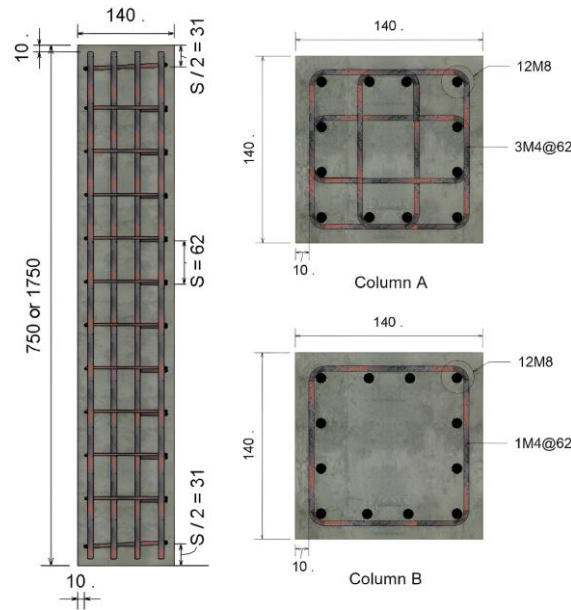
Geometric details of the 1/4-scale square RC column specimens (all dimensions are in mm)
